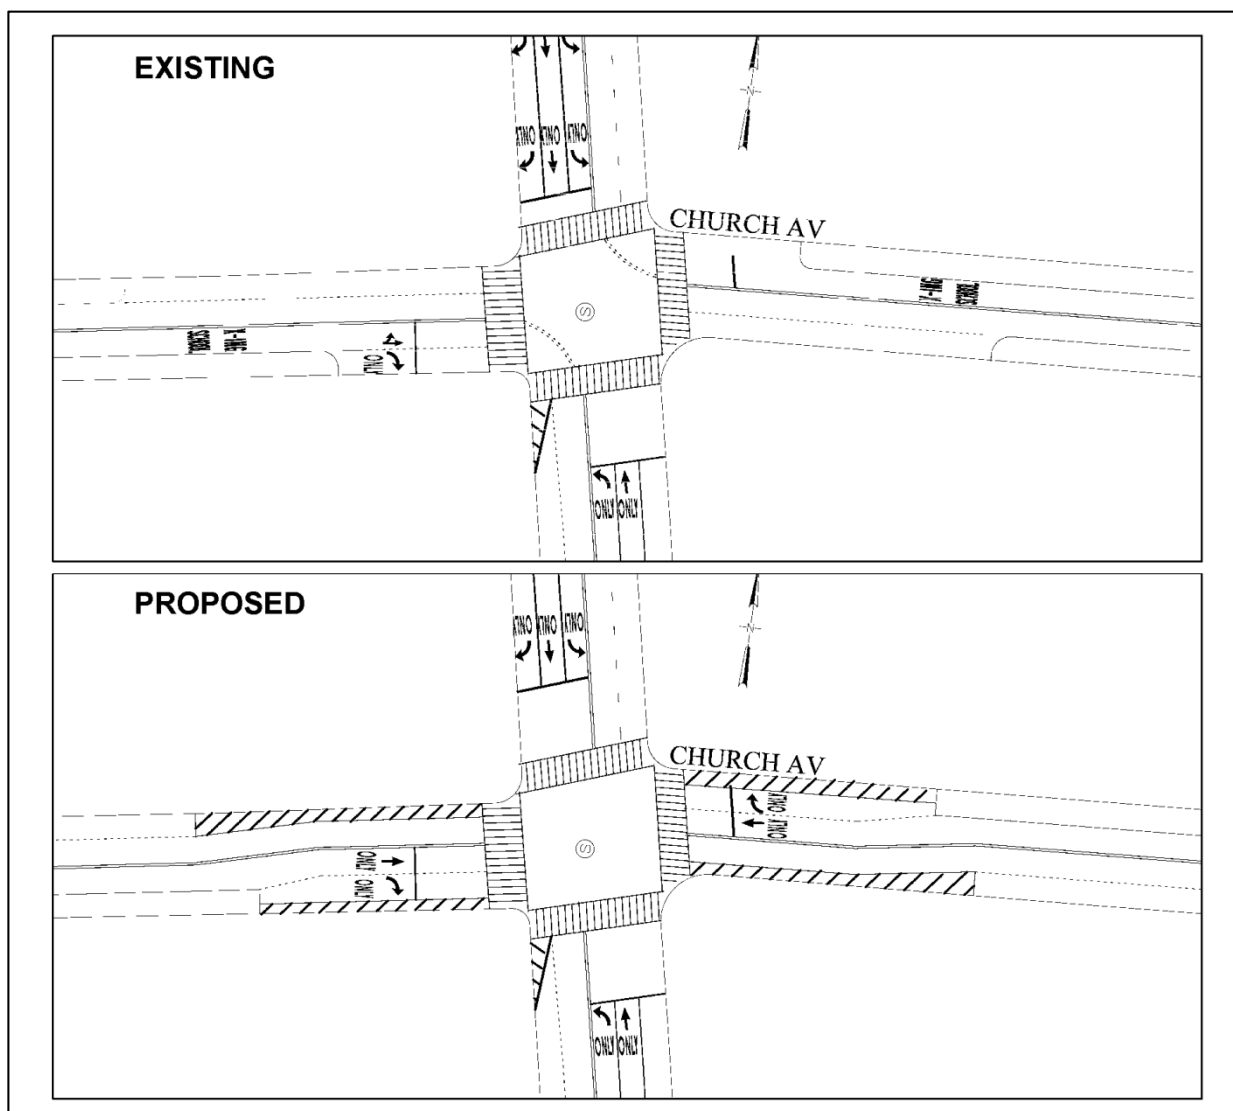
Existing and Proposed layout for Flatbush and Church Avenues
